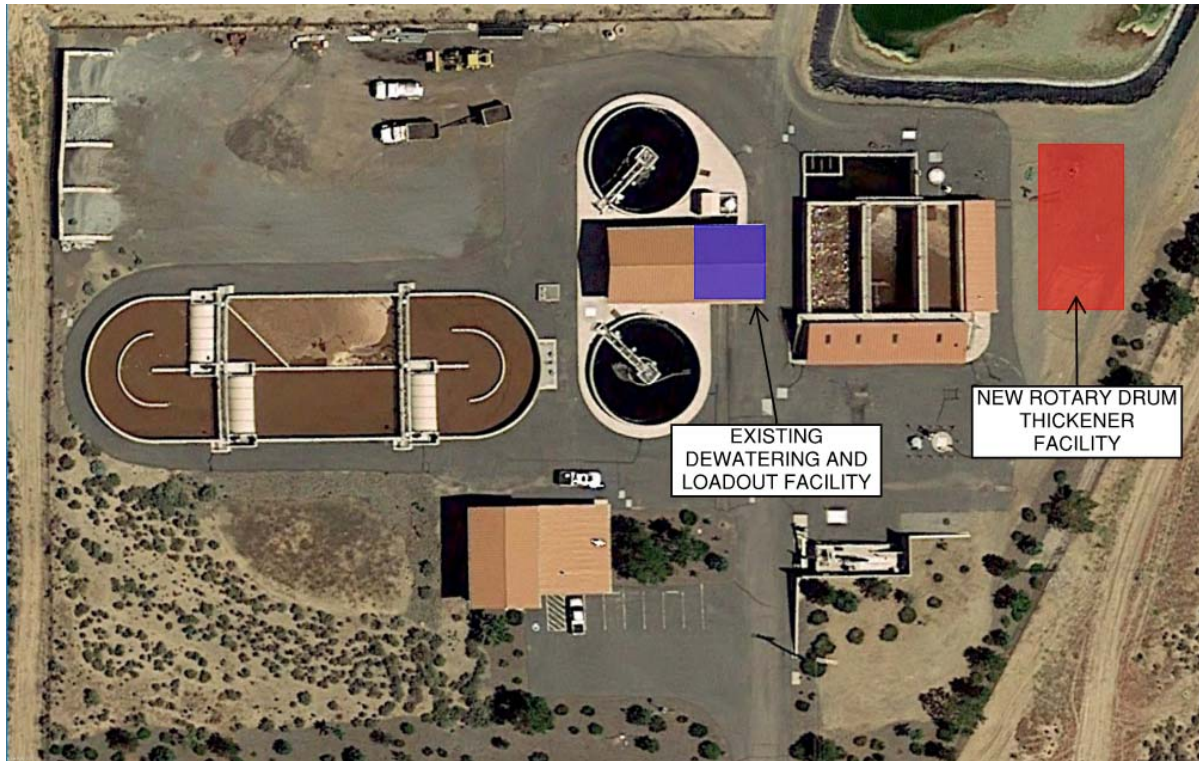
Option 1 Digestion and Dewatering Improvements
